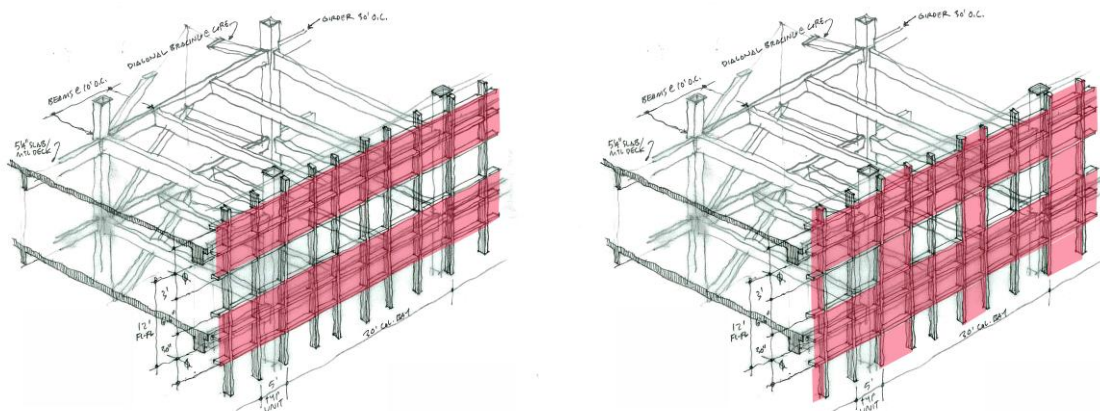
Varying degrees of opacity and structural potential on the elevation correlate to spandrel area; spandrel and column area.
